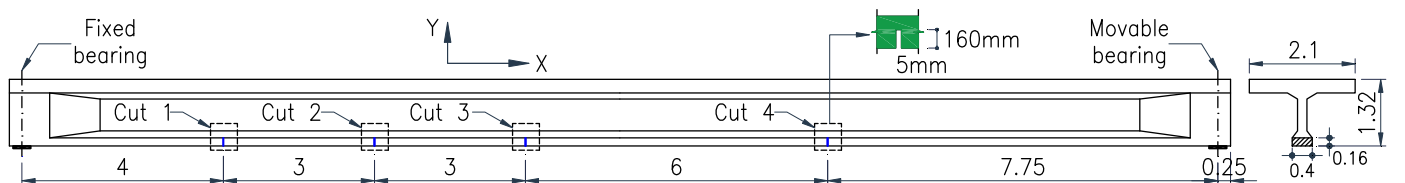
Schematic of a 24.25-meter concrete T-girder (A) and damage scenarios of Case 2 (unit: m).
